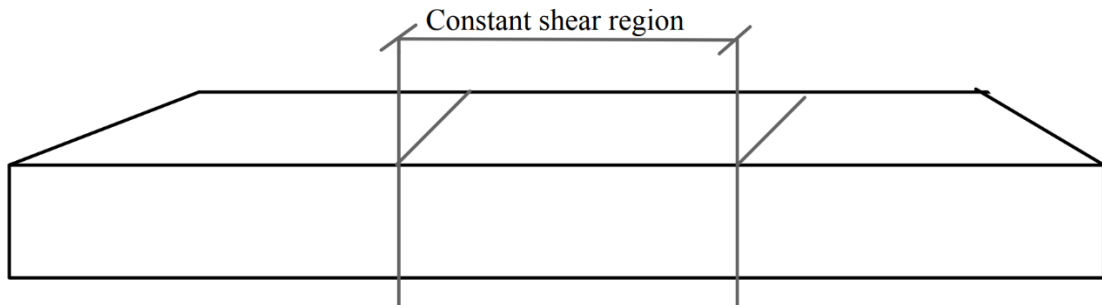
Crack Propagation for Monolithic Control Specimen at 0 % of Final Load
